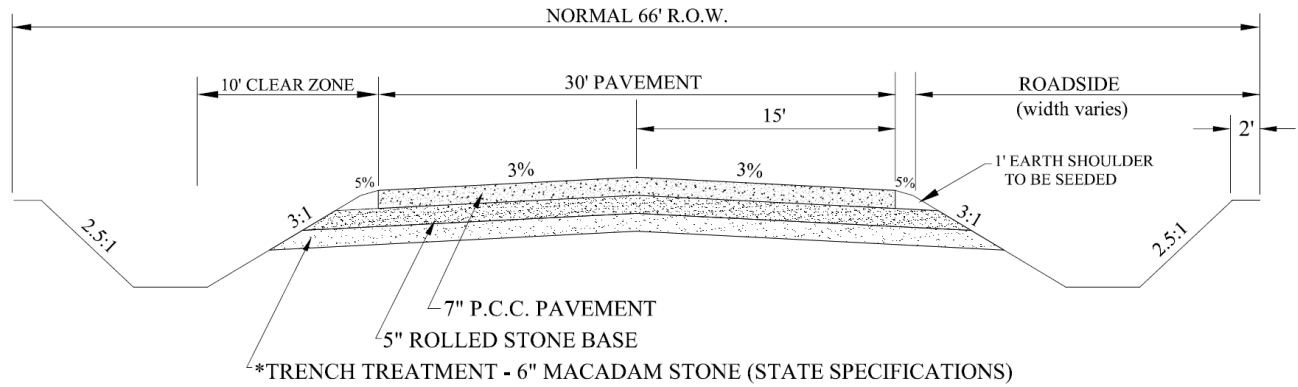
TYPICAL MINIMUM P.C.C. PAVEMENT - OPEN DITCH SECTION
